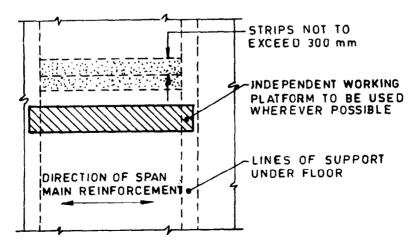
DEMOLITION OF REINFORCED CONCRETE FLOORS
